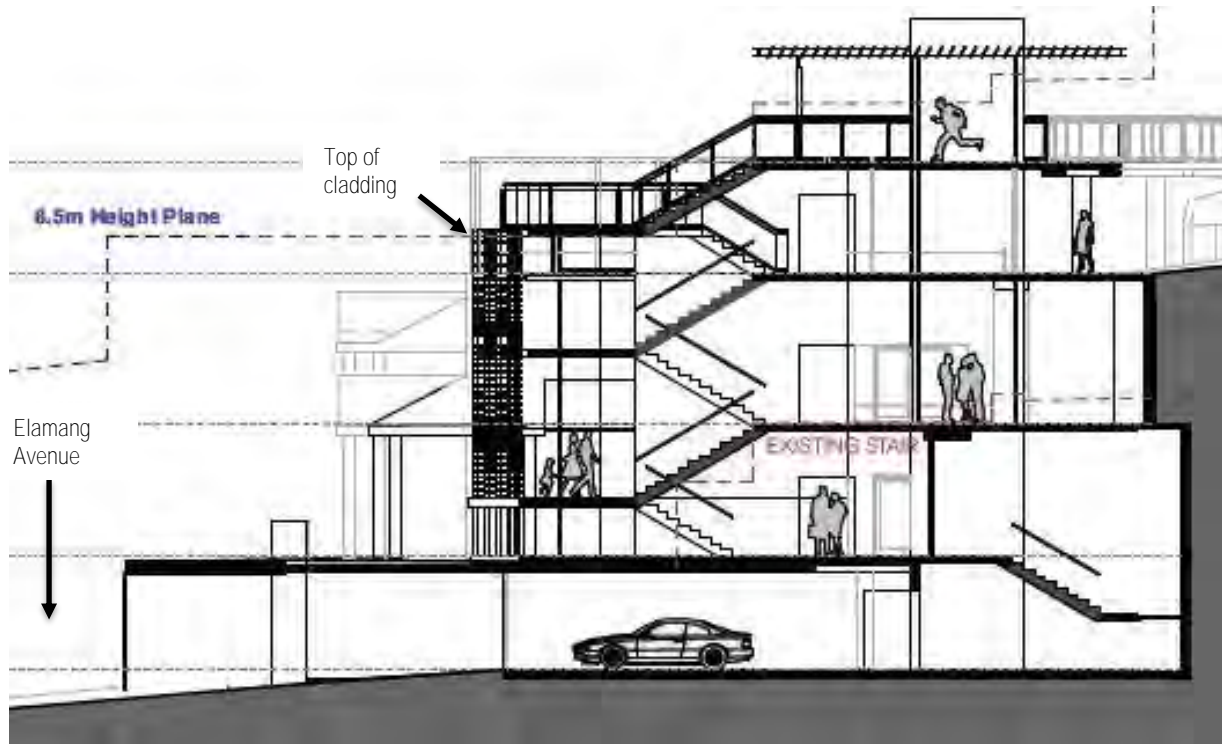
Section through the northern connector pod. The extent of the roof has been curtailed to minimise the bulk of the building. The cladding to the northern elevation of the stair extends to a height that corresponds with the top of Centennial Hall's northeastern wall, reducing the apparent height of the building and visually connecting it to its campus context. (Source: fjmt, 'Section A', excerpt from DA-4003, with GML notations)
